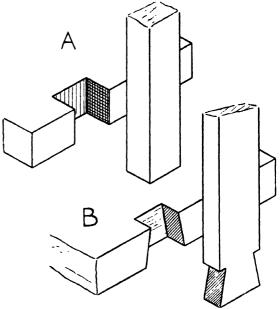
Fixing a Wooden Upright A. Notched baseboard. B. Dovetailed upright
